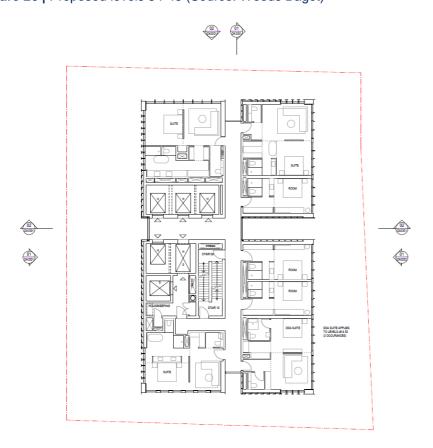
| Proposed levels 46-53 (Source: Woods Bagot)
